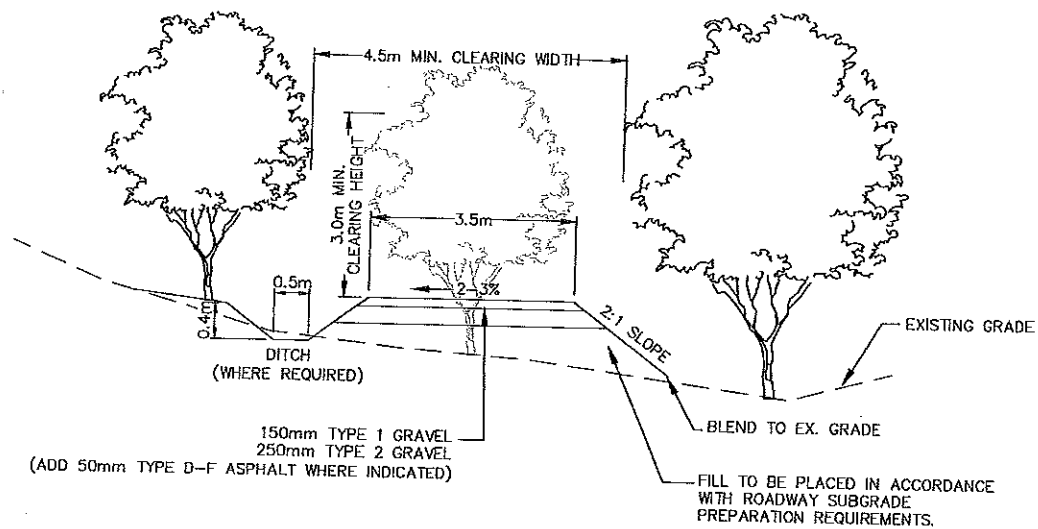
Typical Trail Cross Section for New Trail Construction
